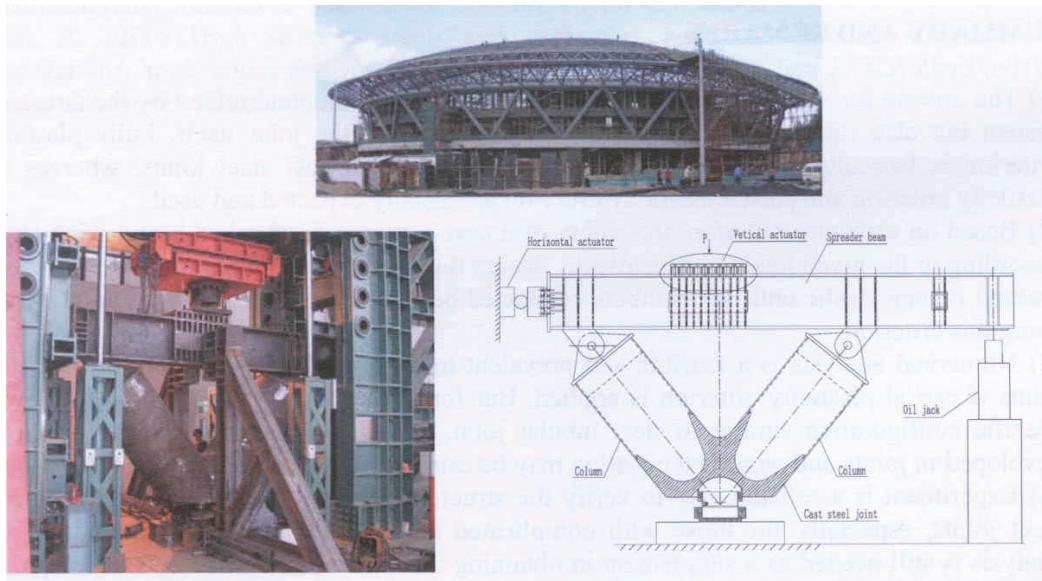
Laoshan Velodrome structure and cast steel detail with test setup. (Courtesy of Professor Y.-Y. Chen)
